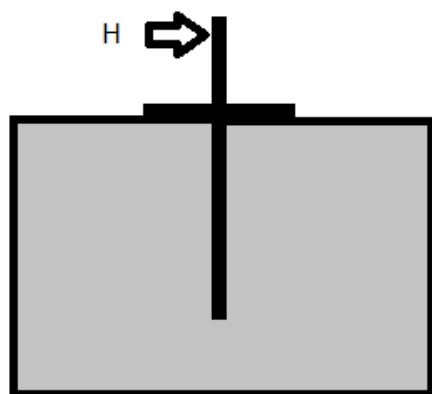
Loading arrangement for centrifuge tests. The lateral load H was purely horizontal.
